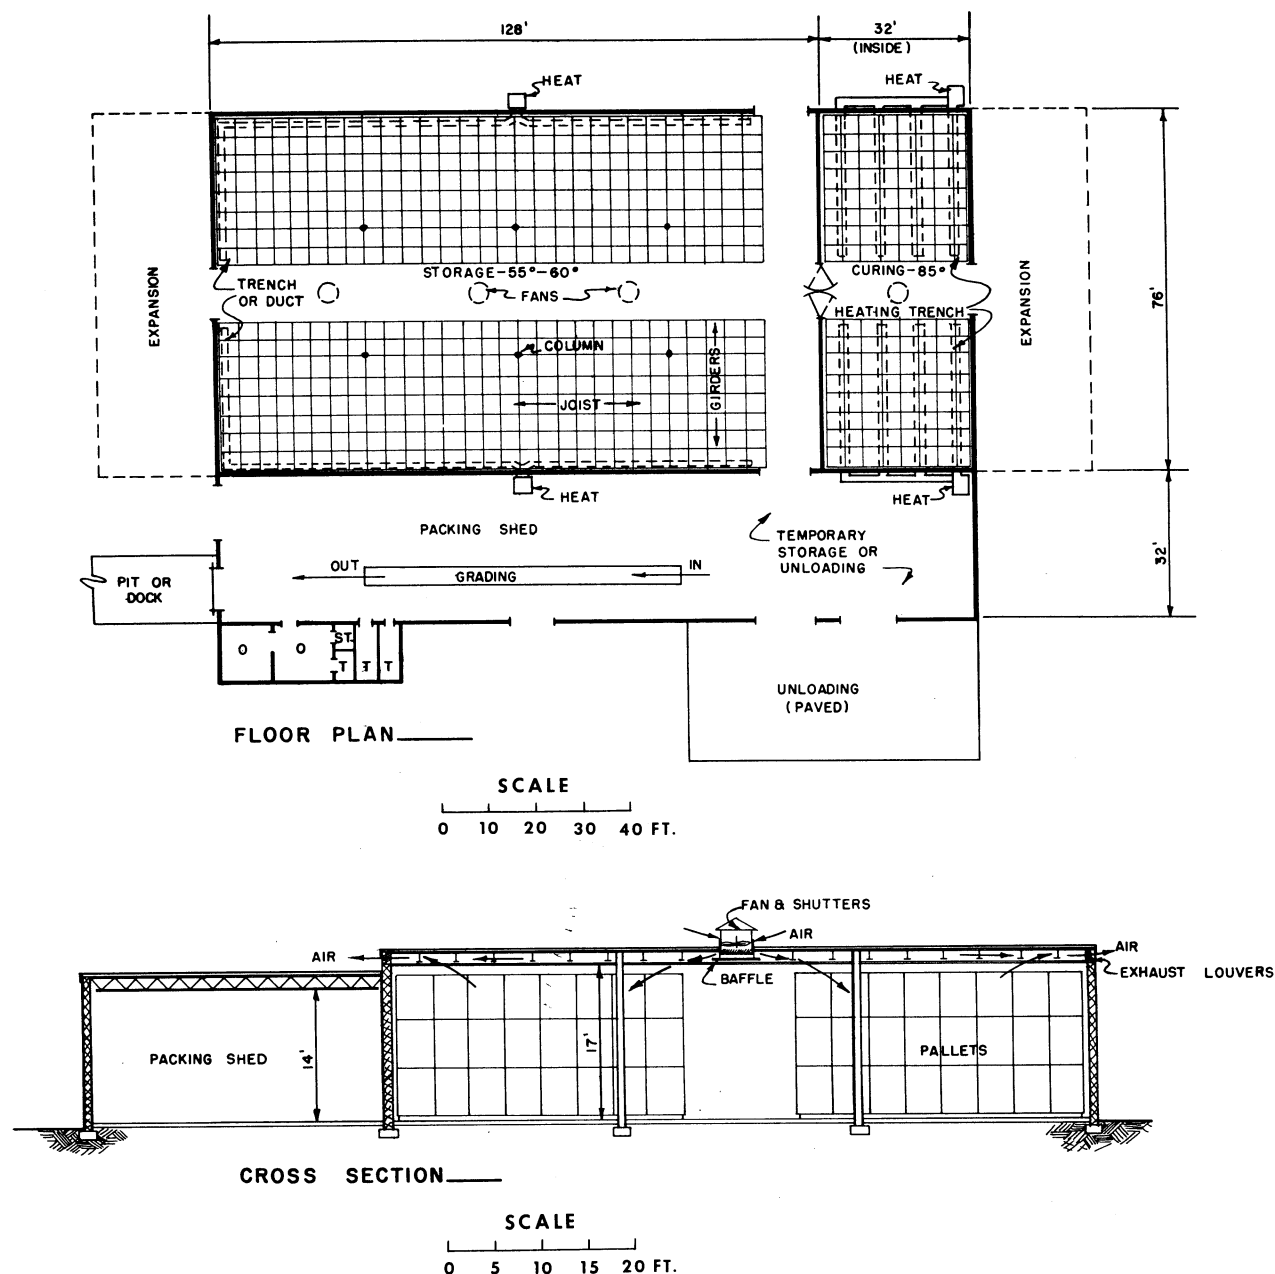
Schematic floor plan for a storage composed of a curing room (or rooms) and a separate storage area. This system is recommended only for storages which are equipped to handle palletized field crates (or bulk bins). The sweetpotatoes are moved carefully with a forklift to the storage room after they are cured. (Courtesy R. Ritchie, Dept. Biol. and Agr. Engin., N.C. State Univ.)
